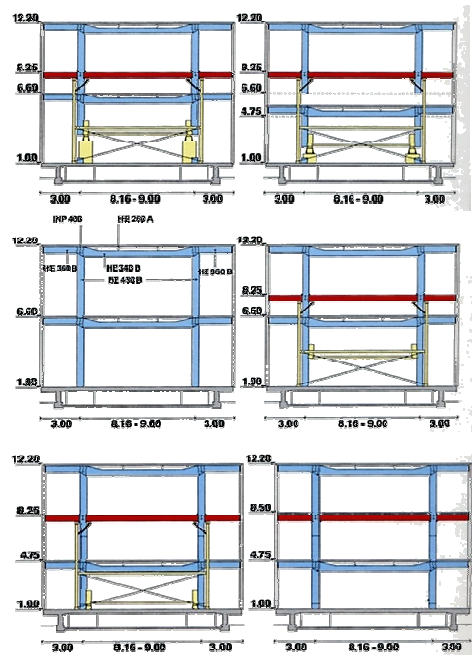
Insertion of an additional floor in an existing steel building (Amstelveen, The Netherlands) (Mazzolani) [159]
